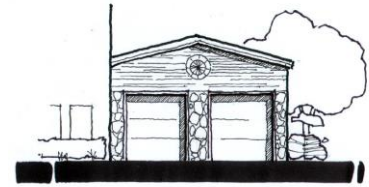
Only single entry doors are allowed if the garage is front loaded and facing the street.
